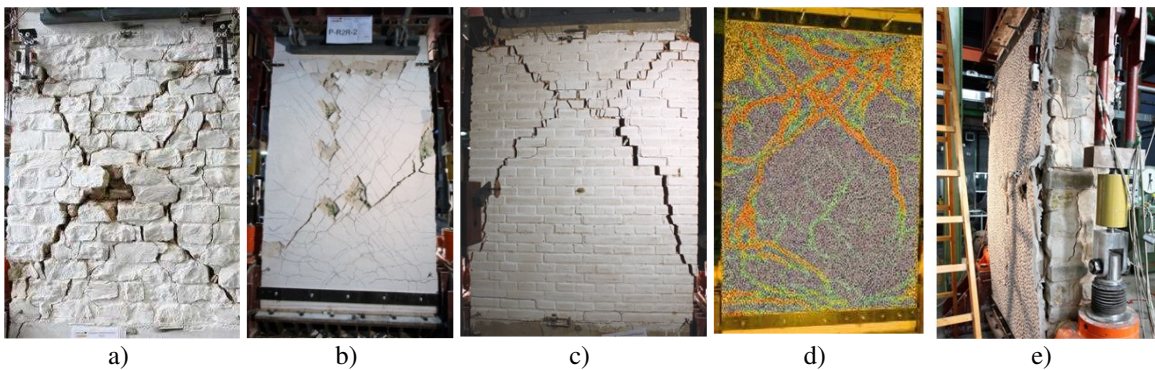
Stone masonry specimen at the end of the shear compression test on unreinforced (a) and reinforced (b) side; brick masonry specimen on the unreinforced (c) and reinforced side (d); detachment of the coating (e)
